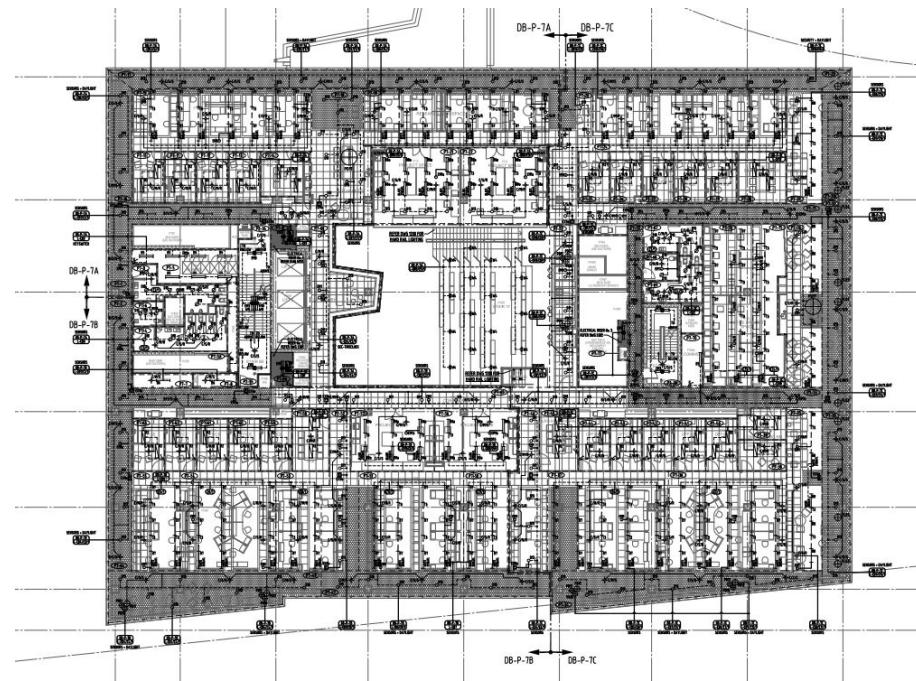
QUT P Block Floor Plan: P Block Level 7 Lighting Layout
